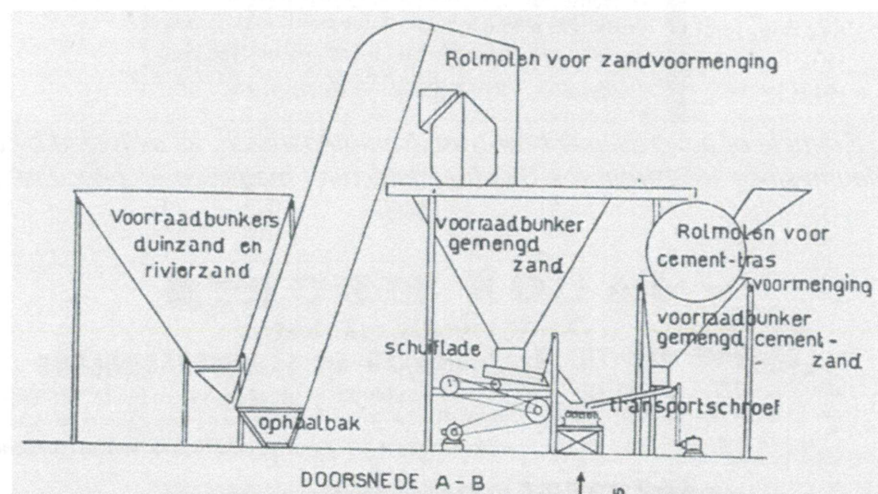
Schematic drawing of the installation to mix trass and Portland cement at the construction site of the 1924-1928 Noordersluis lock (Ringers & Peiser 1925).
